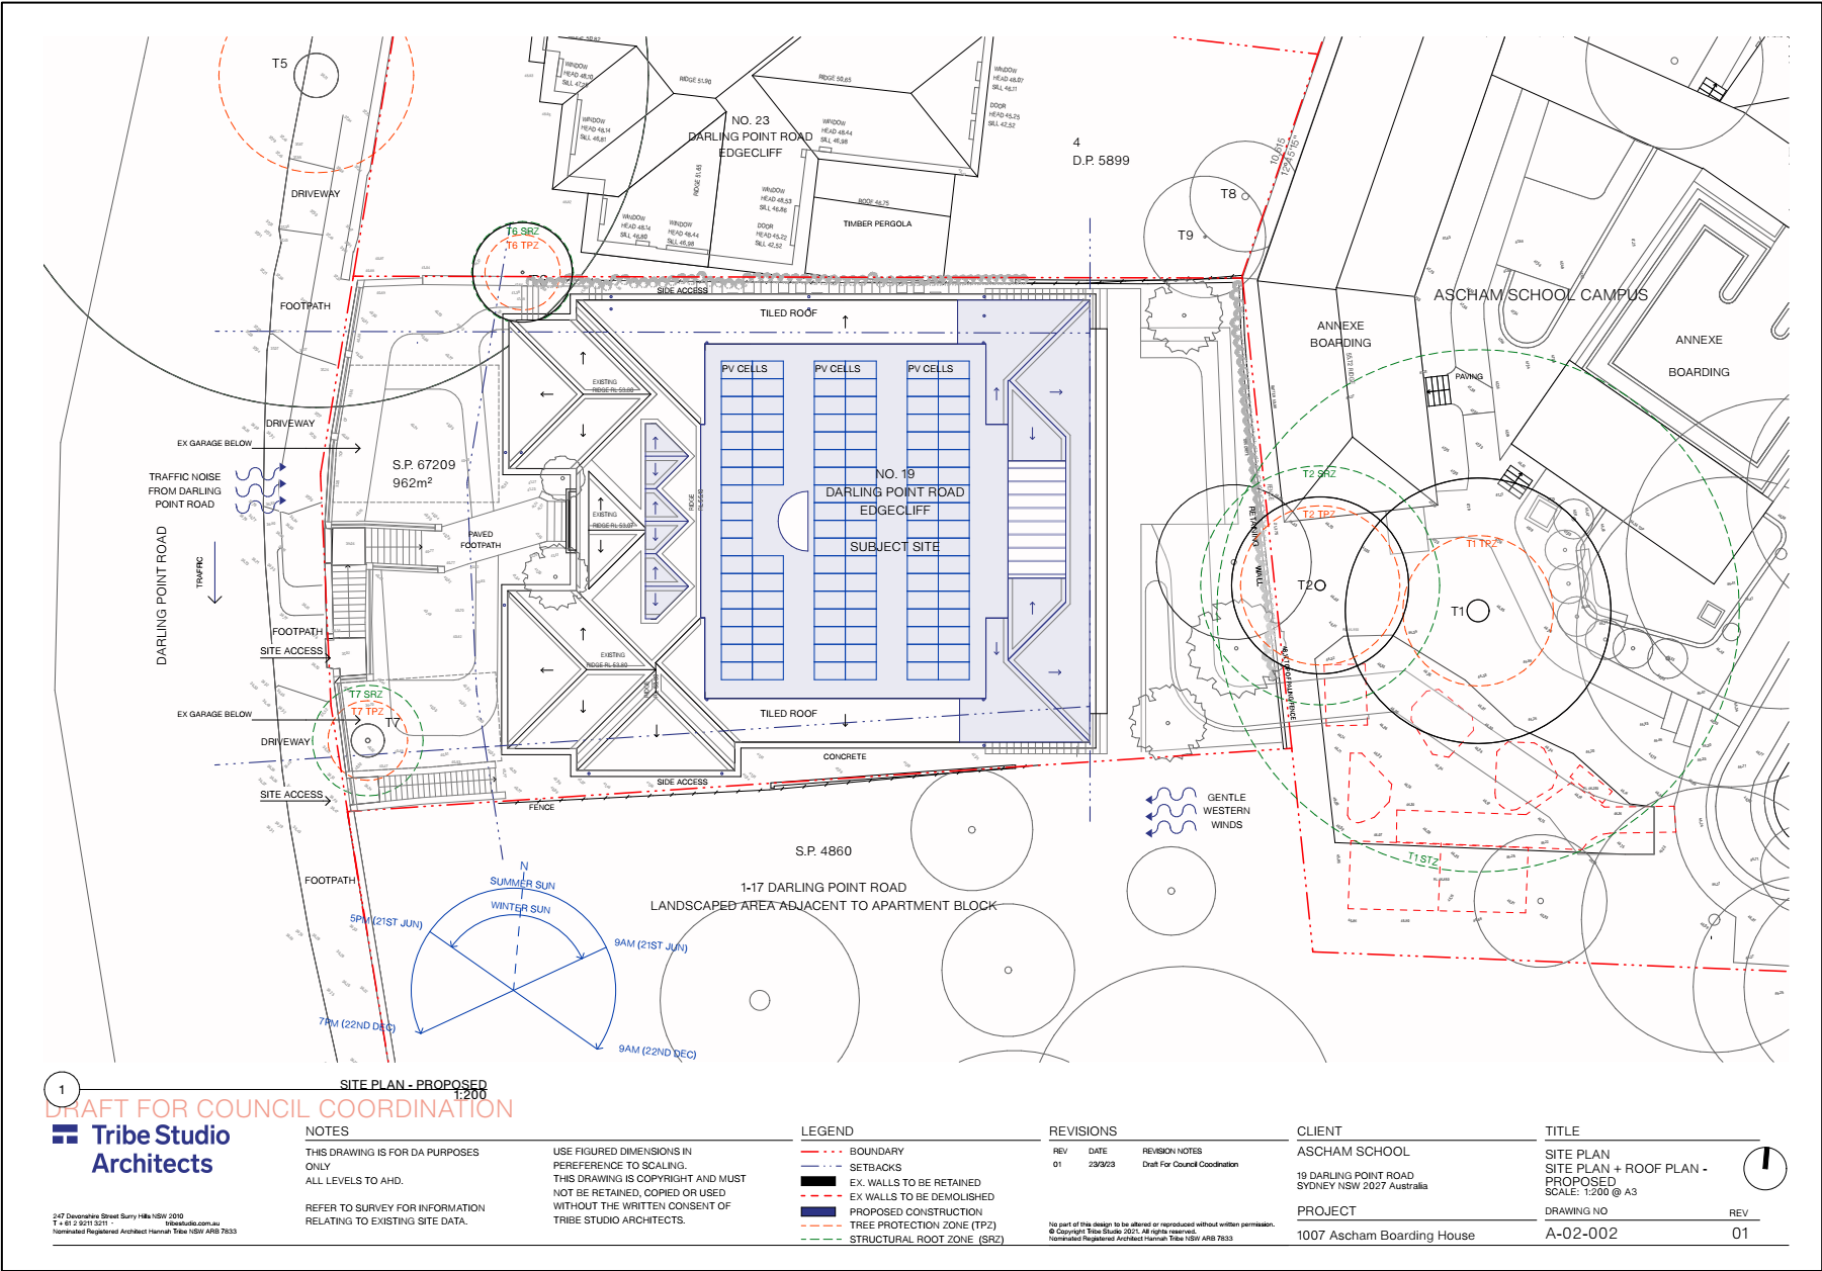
Showing the proposed site plan for 19 Darling Point Road (plan courtesy of Tribe Studio Architects).
